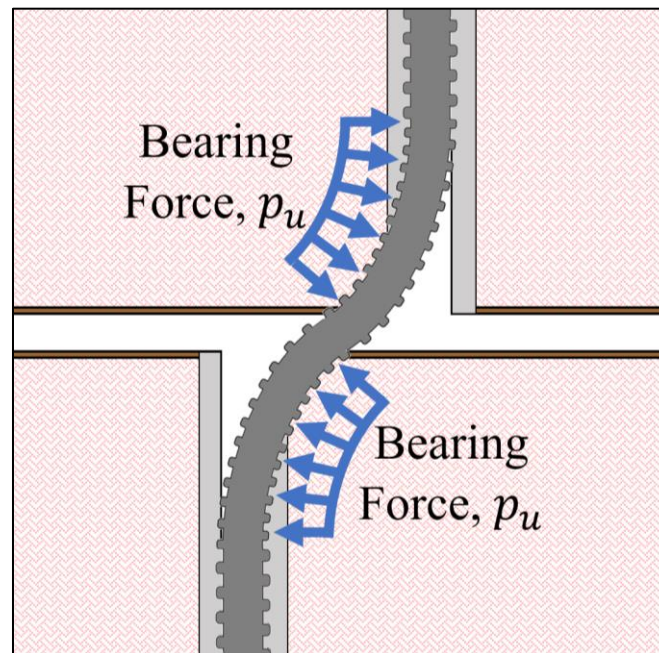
Sheared rebar rock bolt showing some distribution of the bearing force, p_u , that the surrounding rock exerts on the rebar
